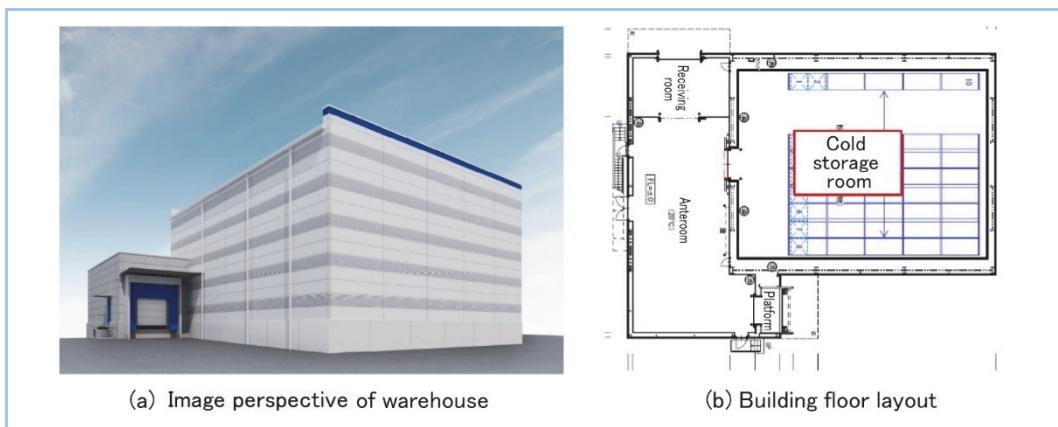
Construction of new refrigerated warehouse for Sankyo Kasei Corporation
